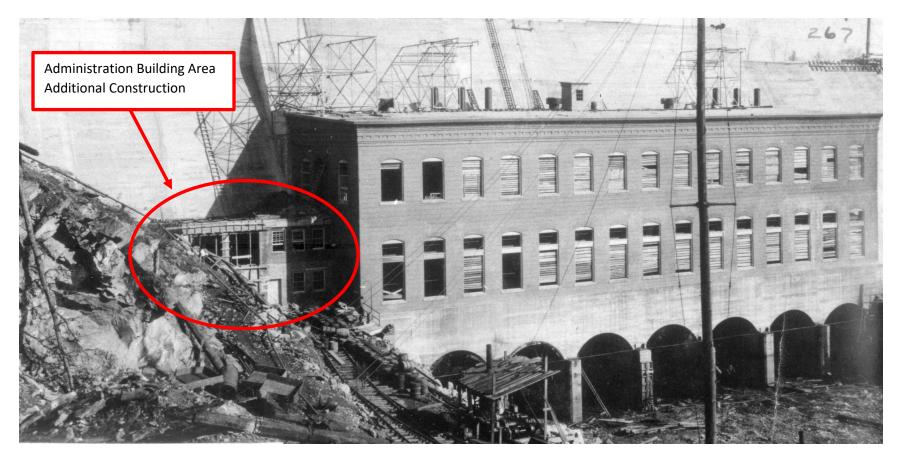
Powerhouse and West Nonoverflow Construction Progress as of 10/31/1910
